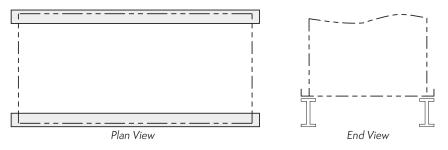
Steel Support, 8.5' (2.5m), 10' (3m) and 12' (3.6m) wide models
